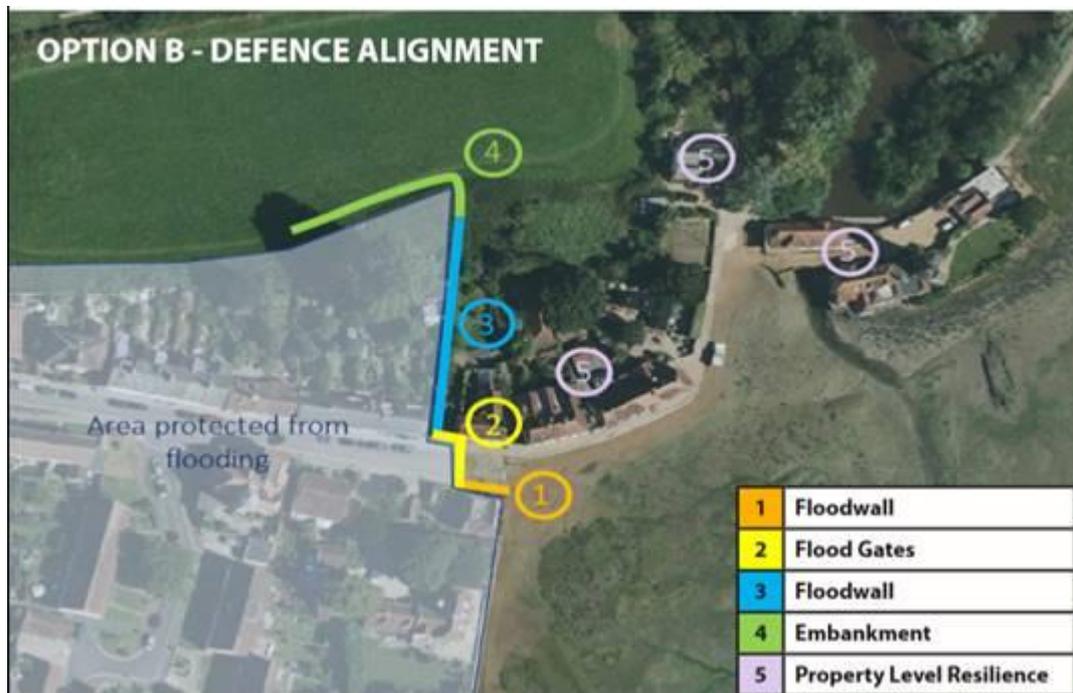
Alternative alignment comprising a floodwall adjacent to the Winkle Market leading to flood gates in Langstone High Street, a floodwall extending north from the High Street leading to an embankment in the field to the north. No defence works undertaken along the Royal Oak frontage
